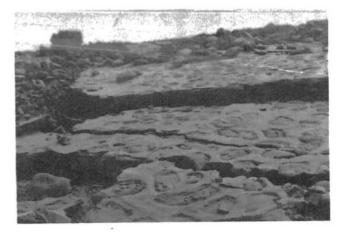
Photogragh of longitudinal cracks on the upstream slope of Kashi earth dam
